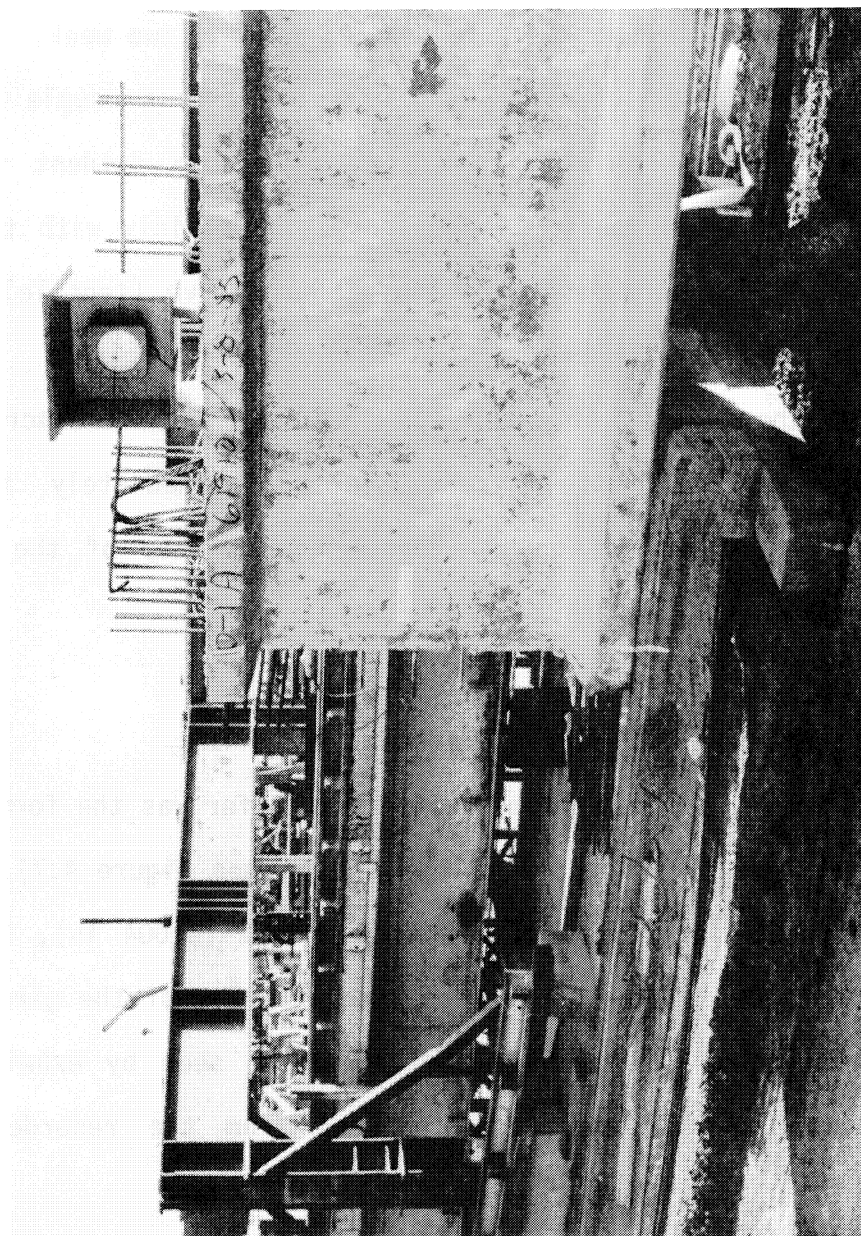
Girder on storage supports with crack from prestress transfer visible at the approximate centroid.
